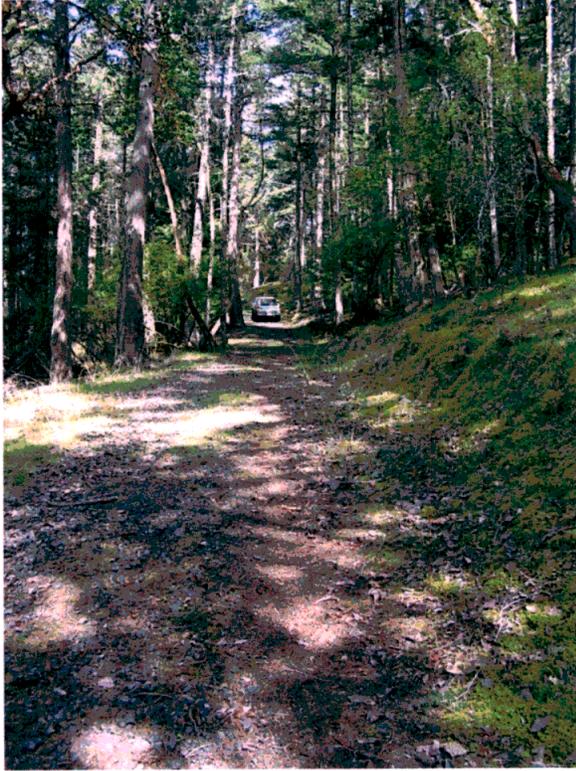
(4-22-12) - DRIVEWAY ABOVE SHORELINE ON WESTSIDE
